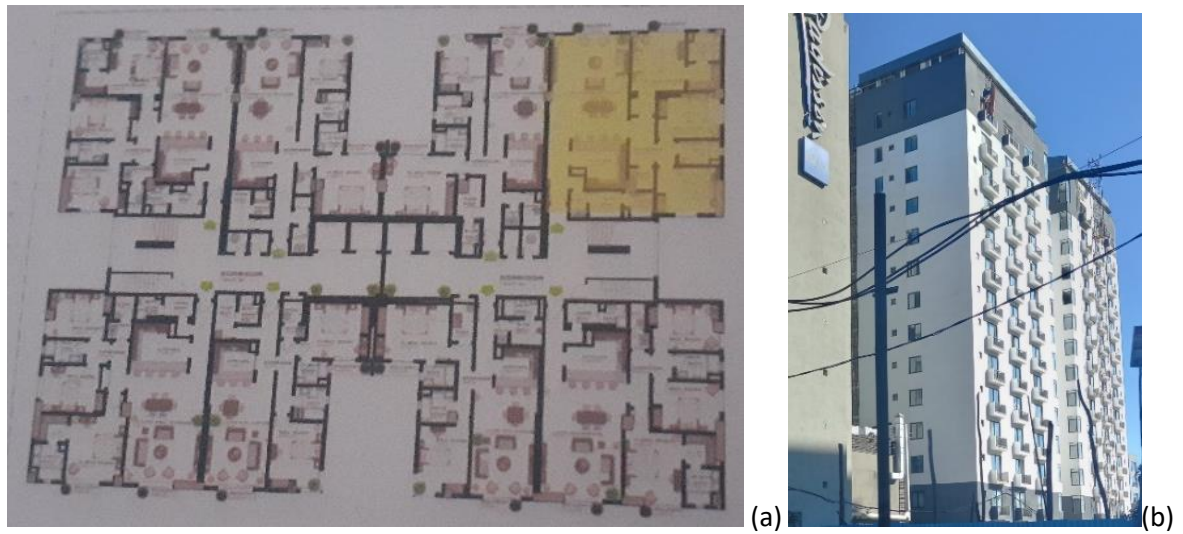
Sacuur Apartment ((a) Floor plan and (b) 3D view)
